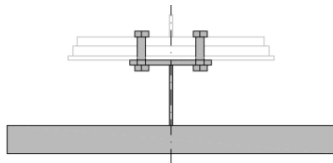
Strengthening of the main girder, Kreekrak Bridge
